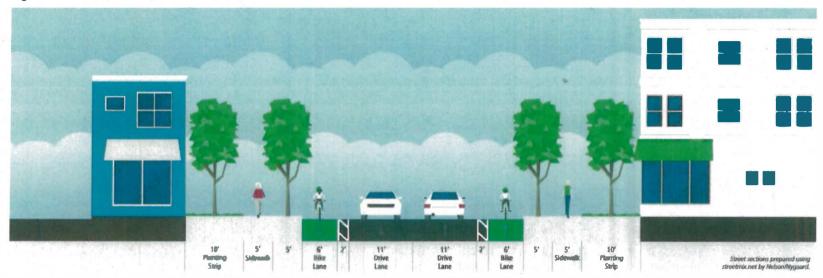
Transit Boulevard: Potential Configuration of Shoreline Boulevard between Pear Avenue and Plymouth Street Looking North
